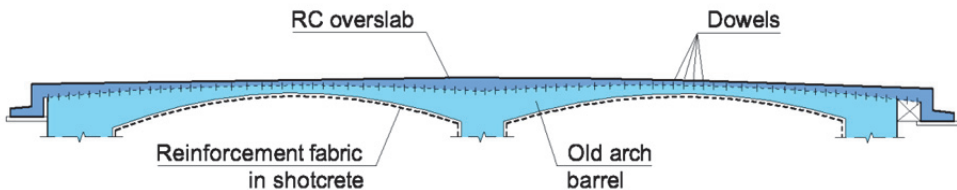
Longitudinal section through the arch superstructure with strengthening overslab
